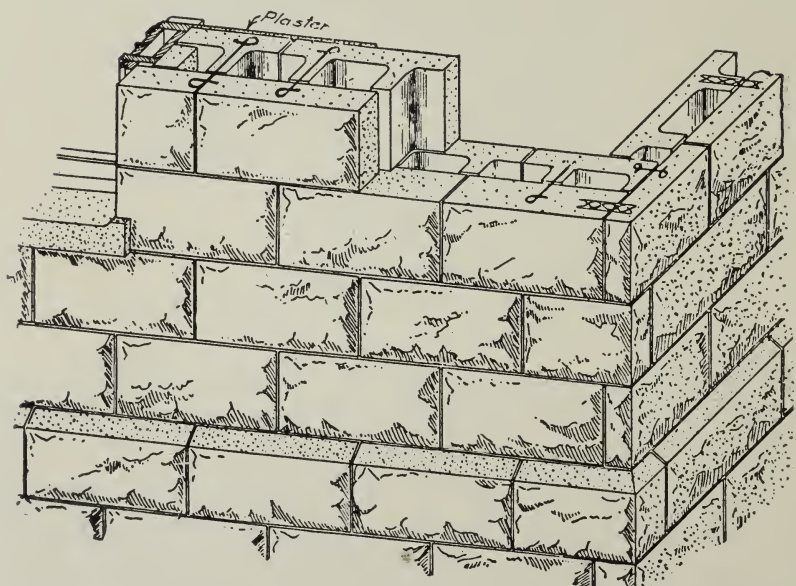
Two-piece Concrete Blocks Used as Backing for Stone or Concrete.
